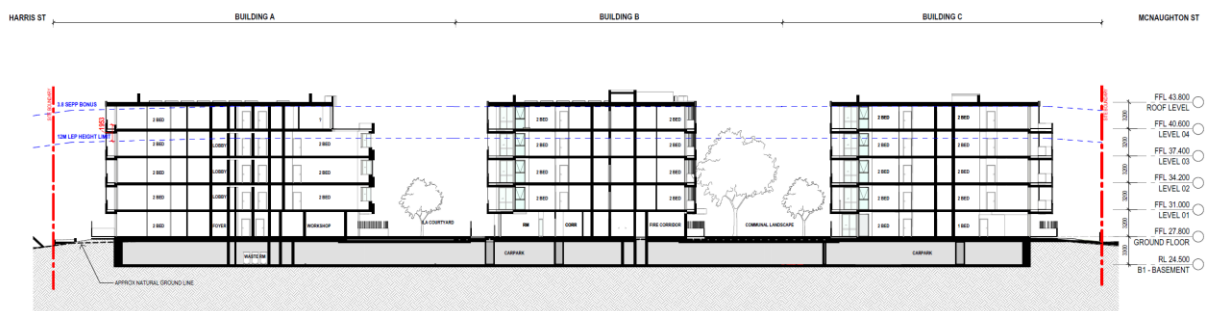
East-west site section showing depth and extent of proposed basement carpark underneath Buildings A, B and C. (Source: Jackson Teece 2024)
